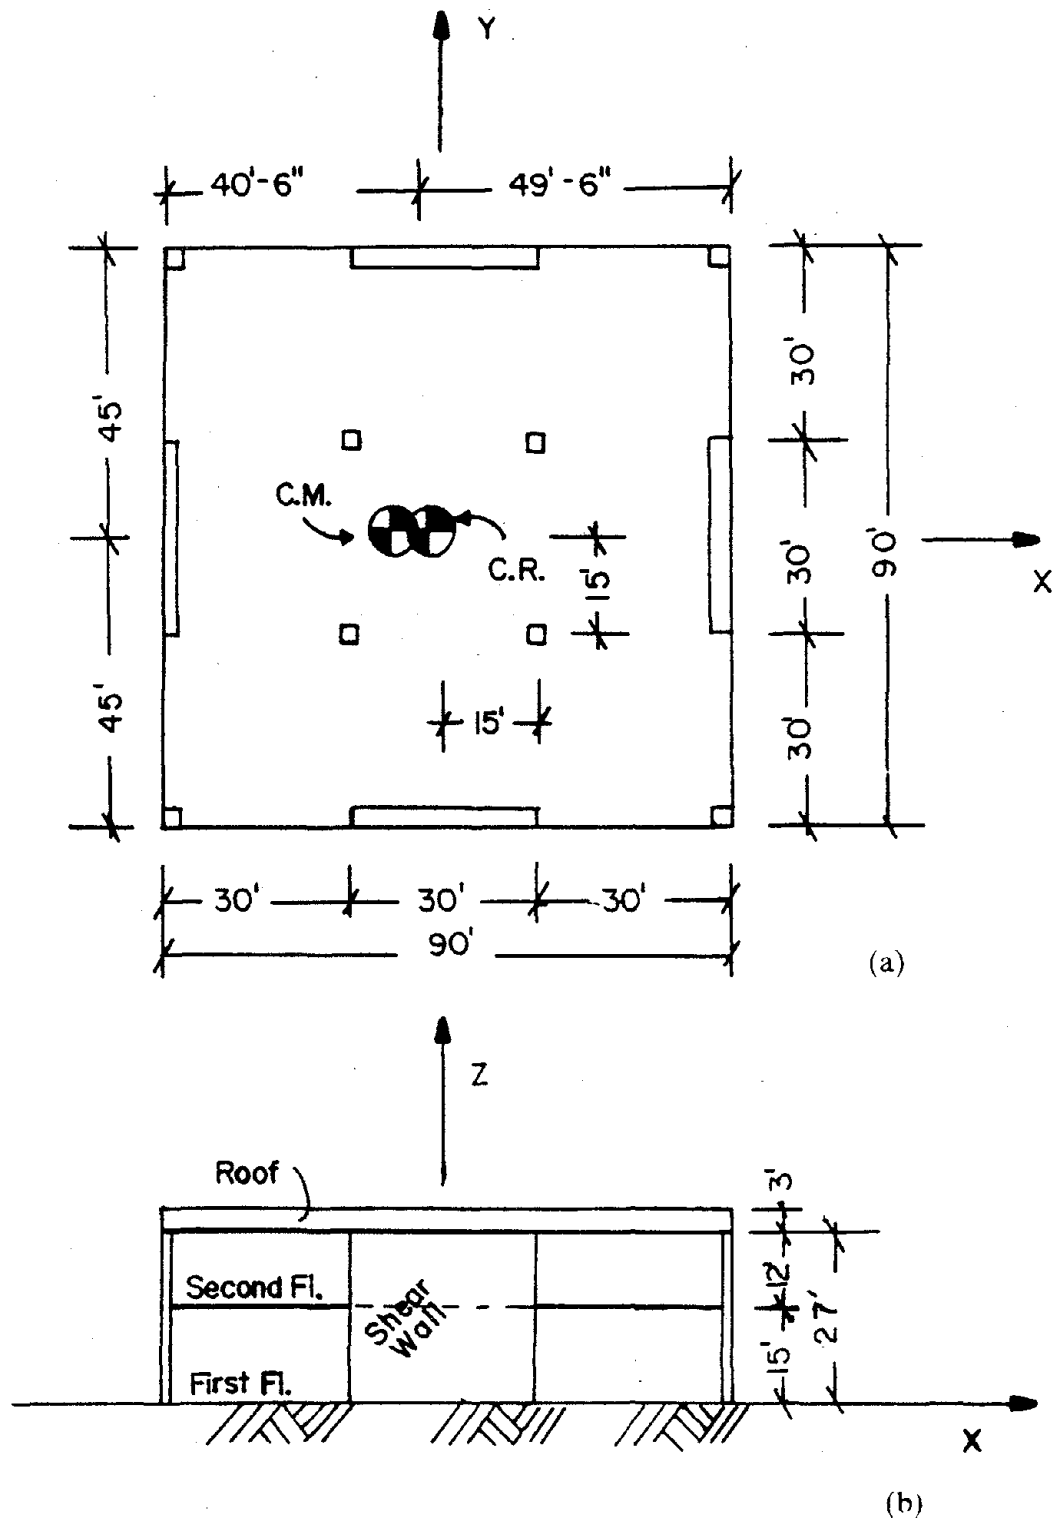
Two-Story Symmetric Building: (a) Plan, (b) Elevation
